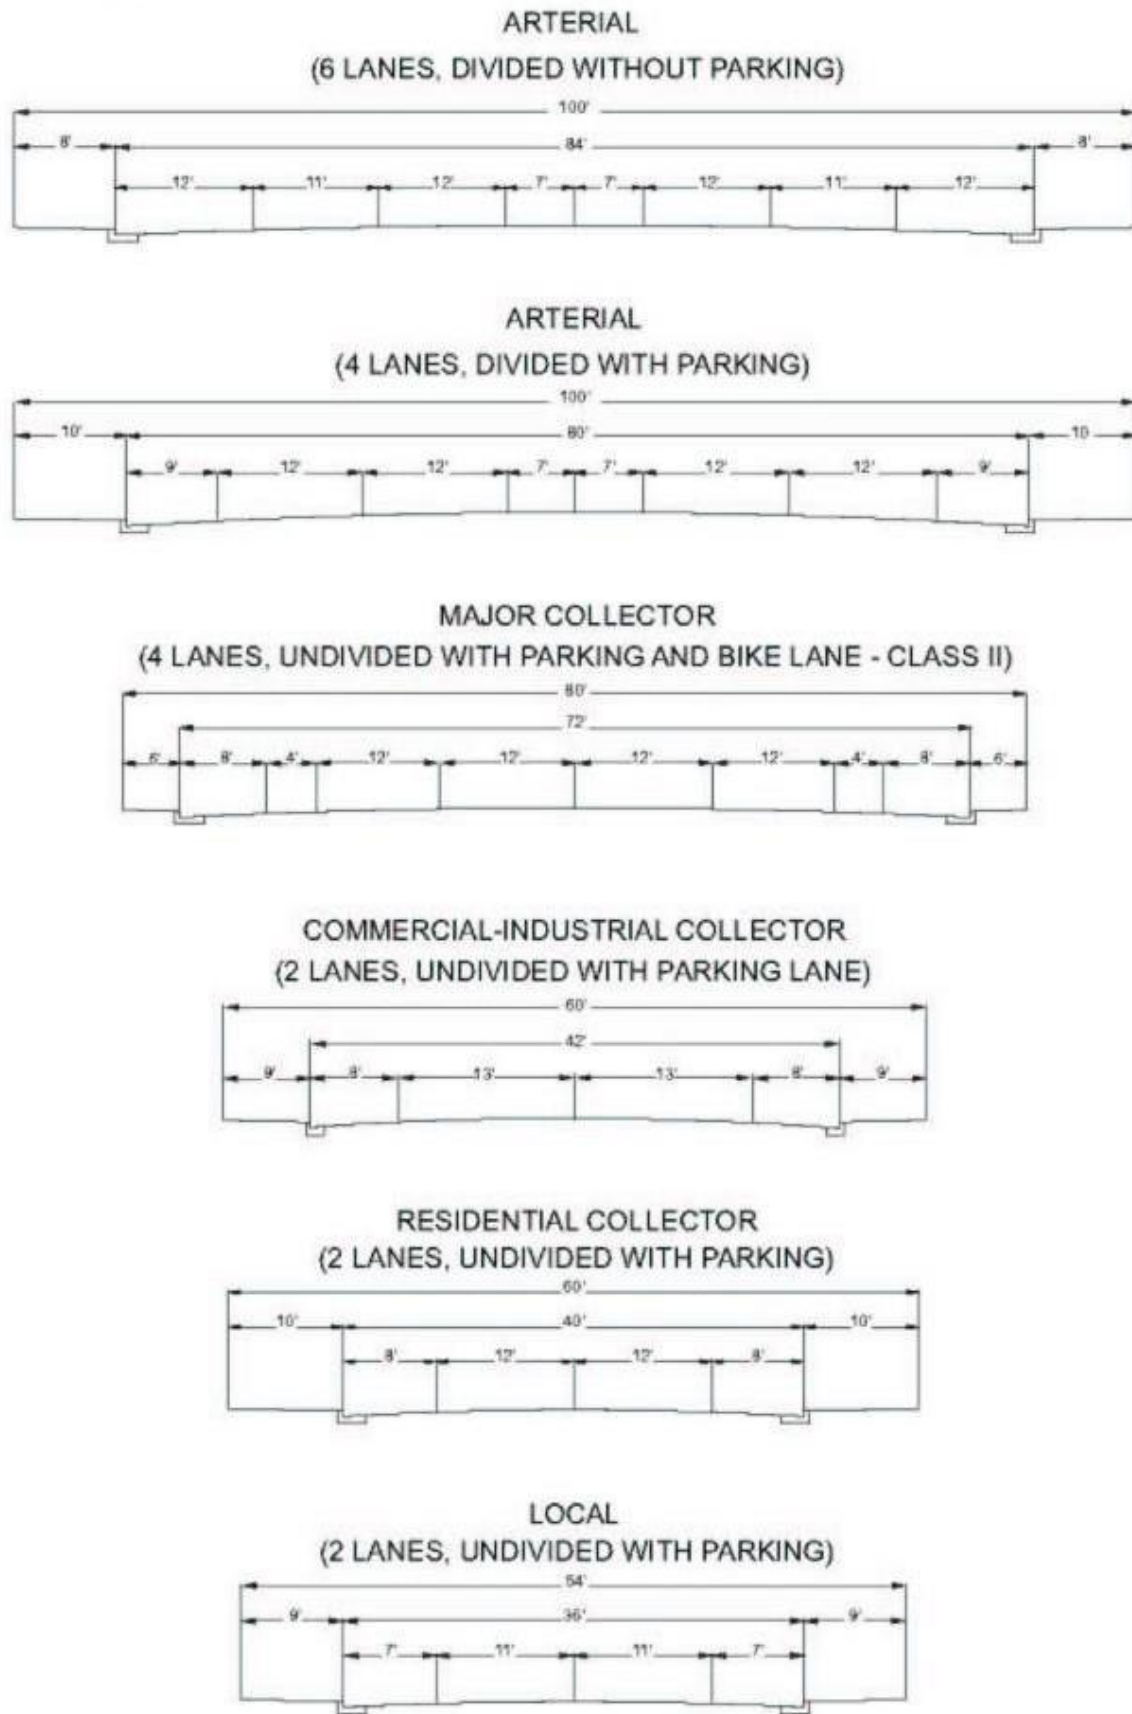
General Plan Circulation Plan Roadway Cross Sections
